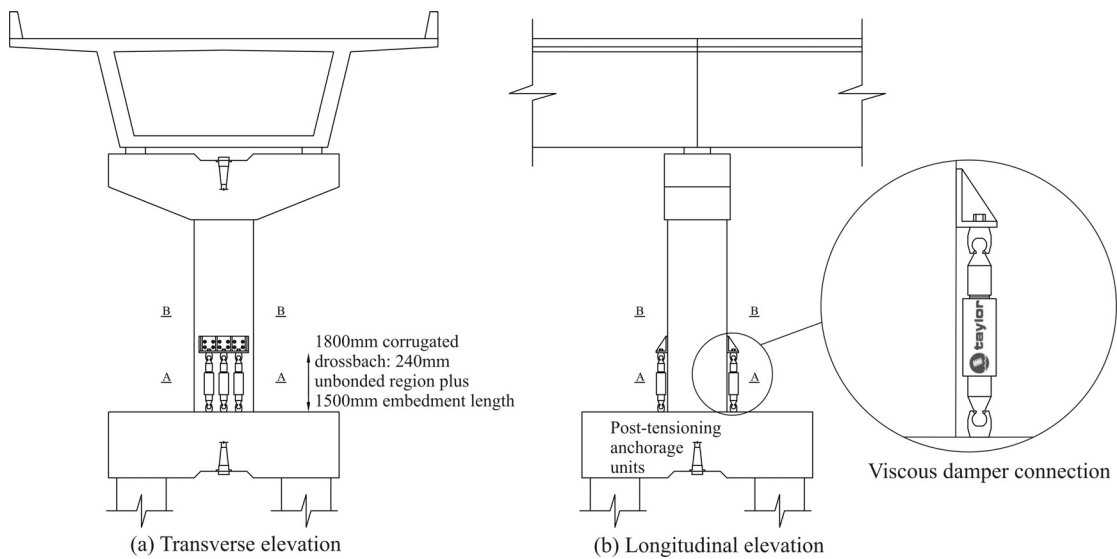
Elevation of the AFS1 hybrid bridge pier
